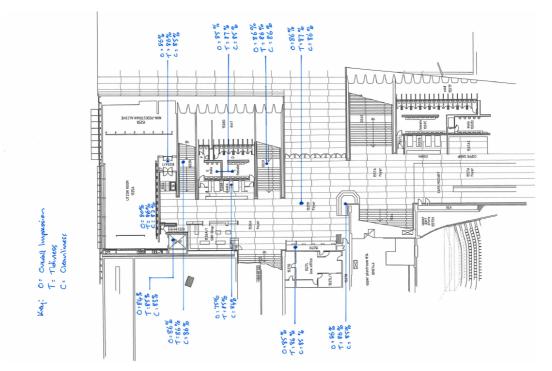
Benchmarking objects in SOH. 2D layout drawings are used to keep track of the benchmarks
